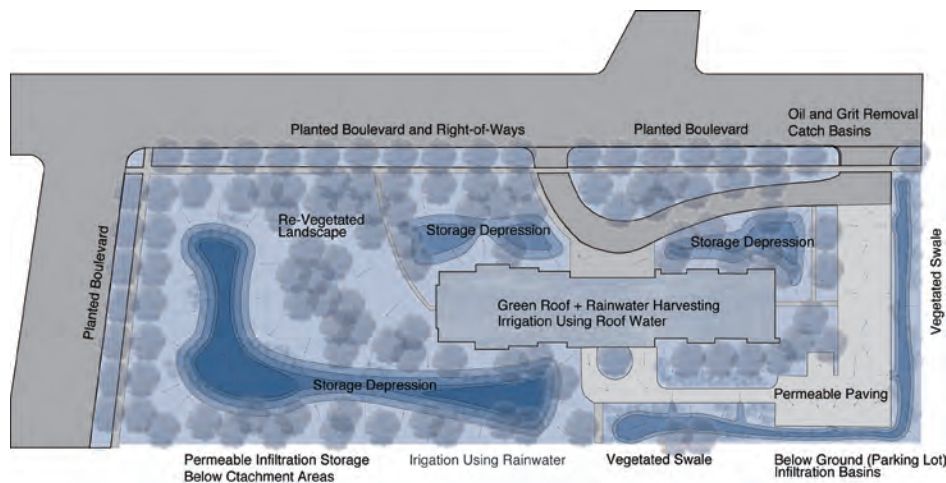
Plan view of BMPs in series applied to the Tower B building and site.
